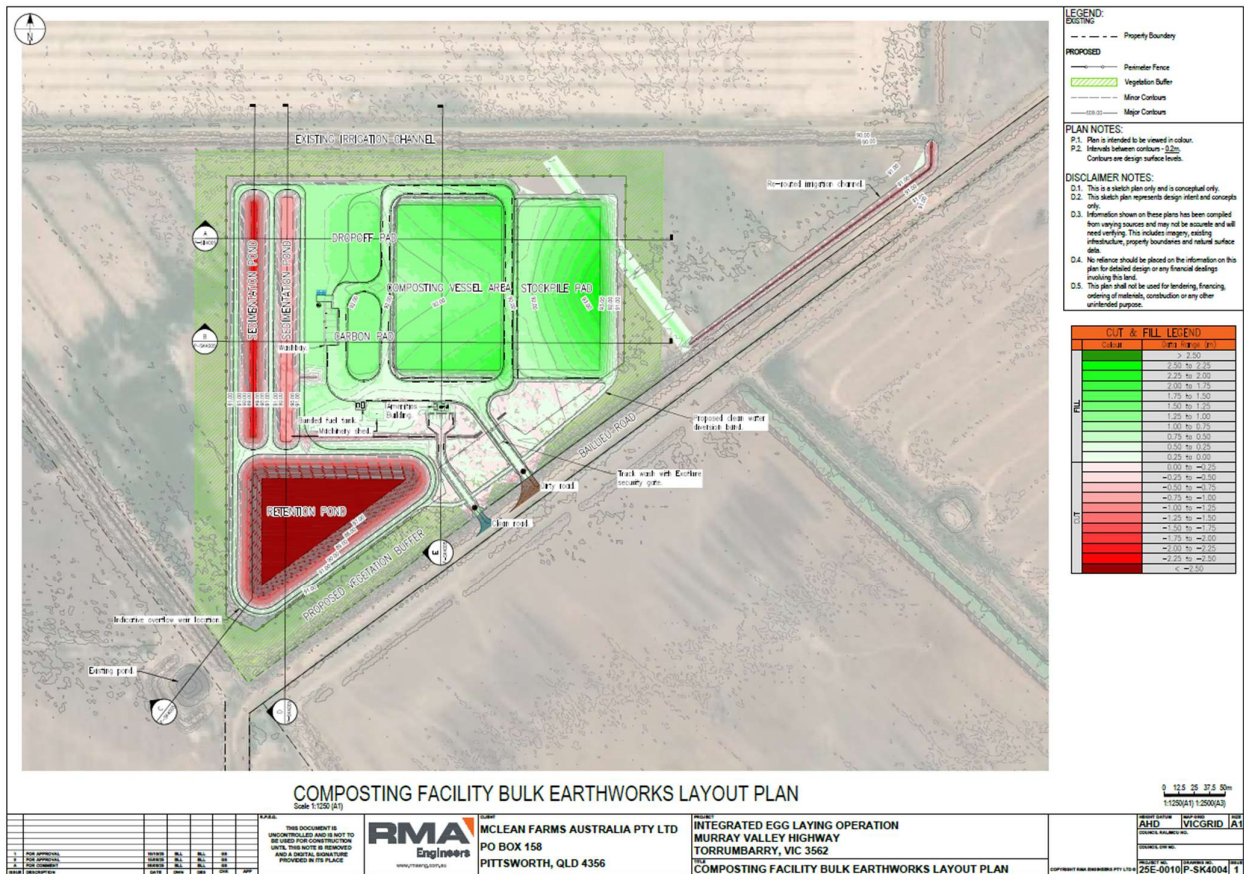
Earthworks layout plan (RMA Engineers, 2025)
